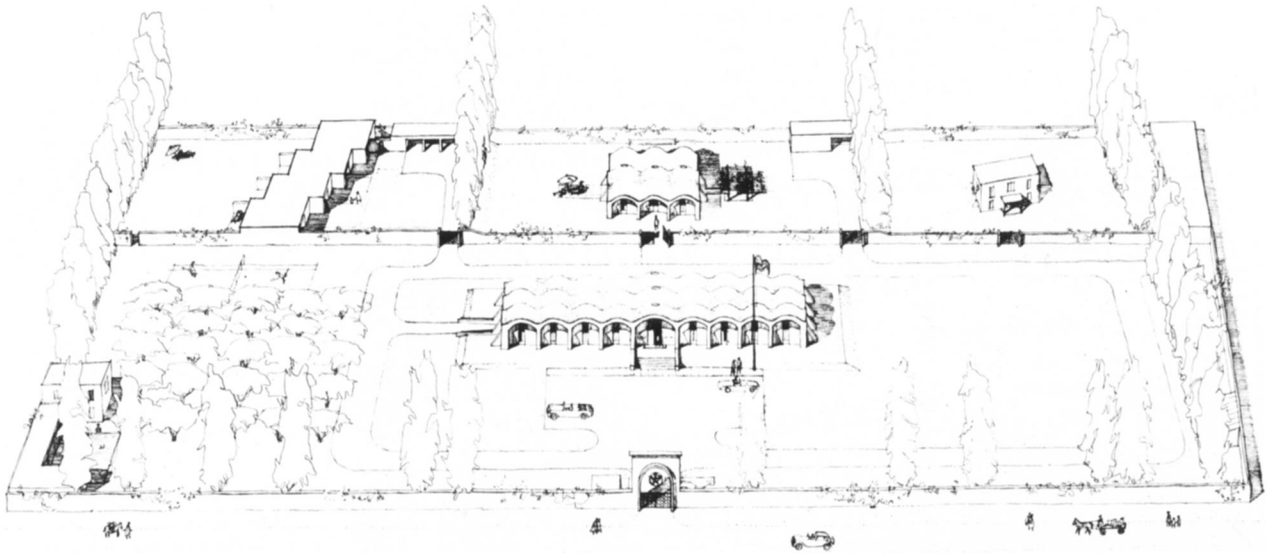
Edward Larrabee Barnes, U.S. Consulate, Tabriz, Iran, 1958–1968, no longer in use by the U.S. Government. Drawing of walled compound for office building and residence (Edward Larrabee Barnes, Architect).
